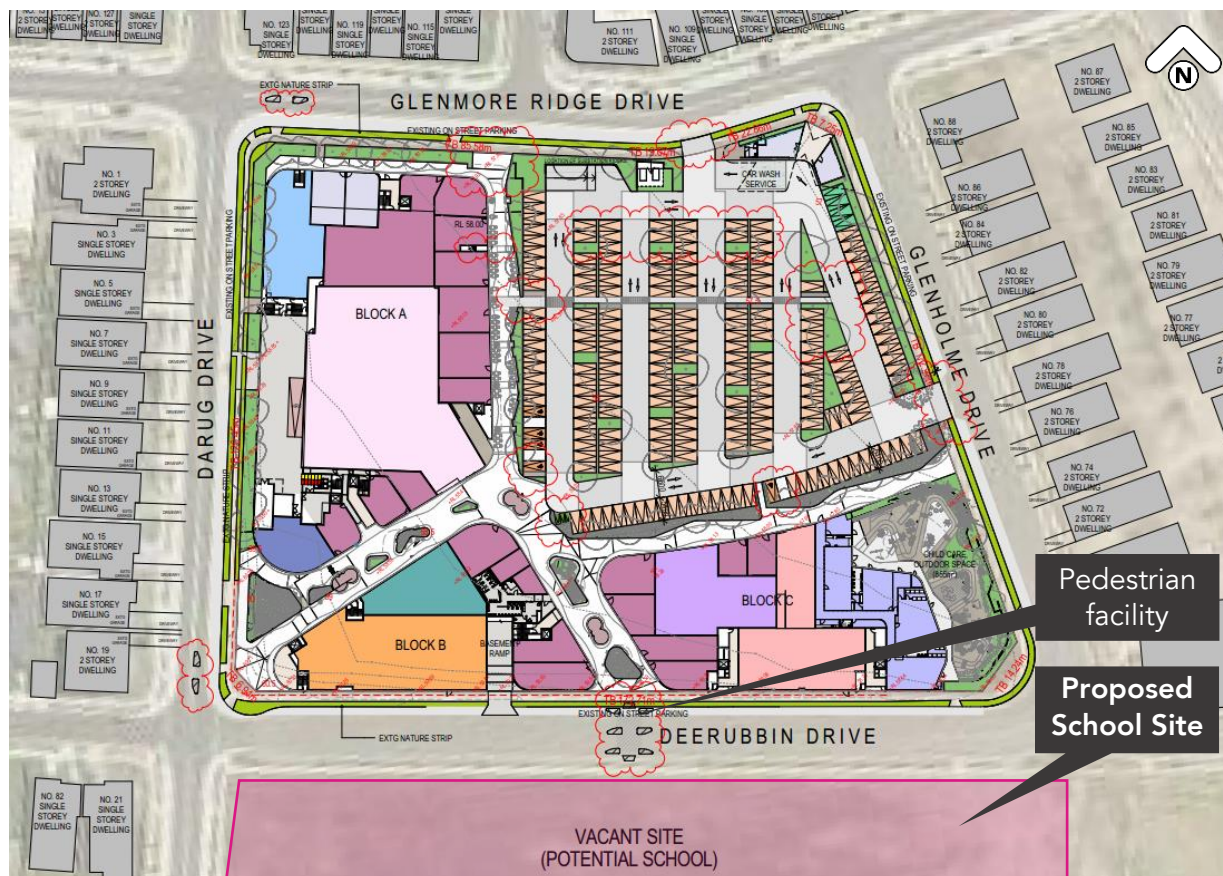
Site Plan - Mixed Use Development at 90-98 Glenmore Ridge Drive (Source: ADARCHITECTS)
